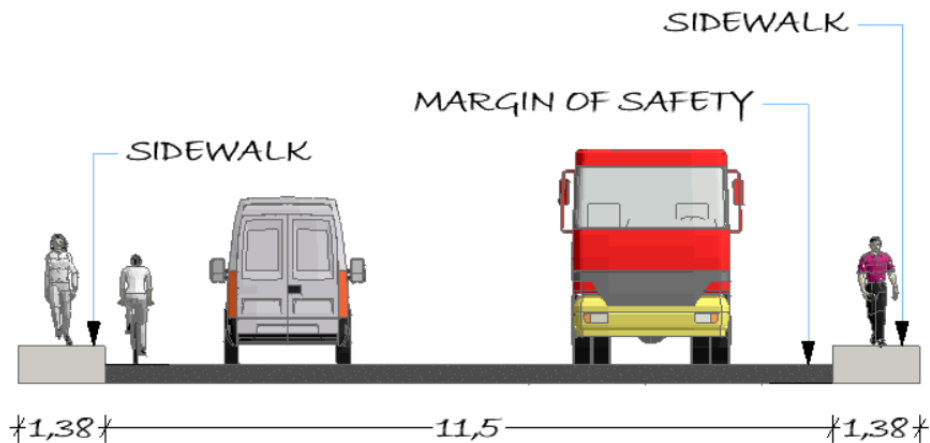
Cross-Section Design of Teluk Dalam Road – Proposed (2029)
